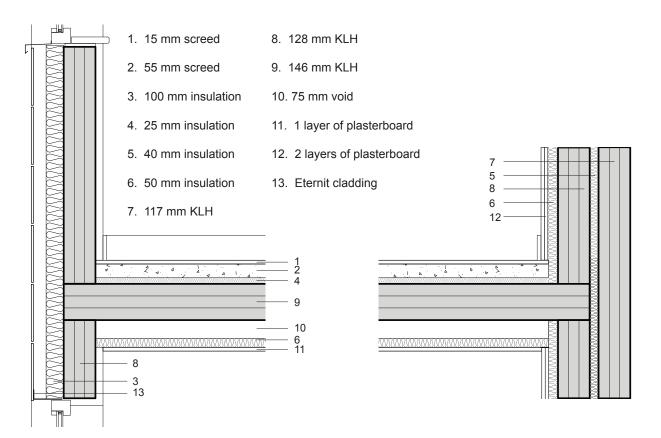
Left: Section at external wall; Right: section at lift shaft Source: Trada
